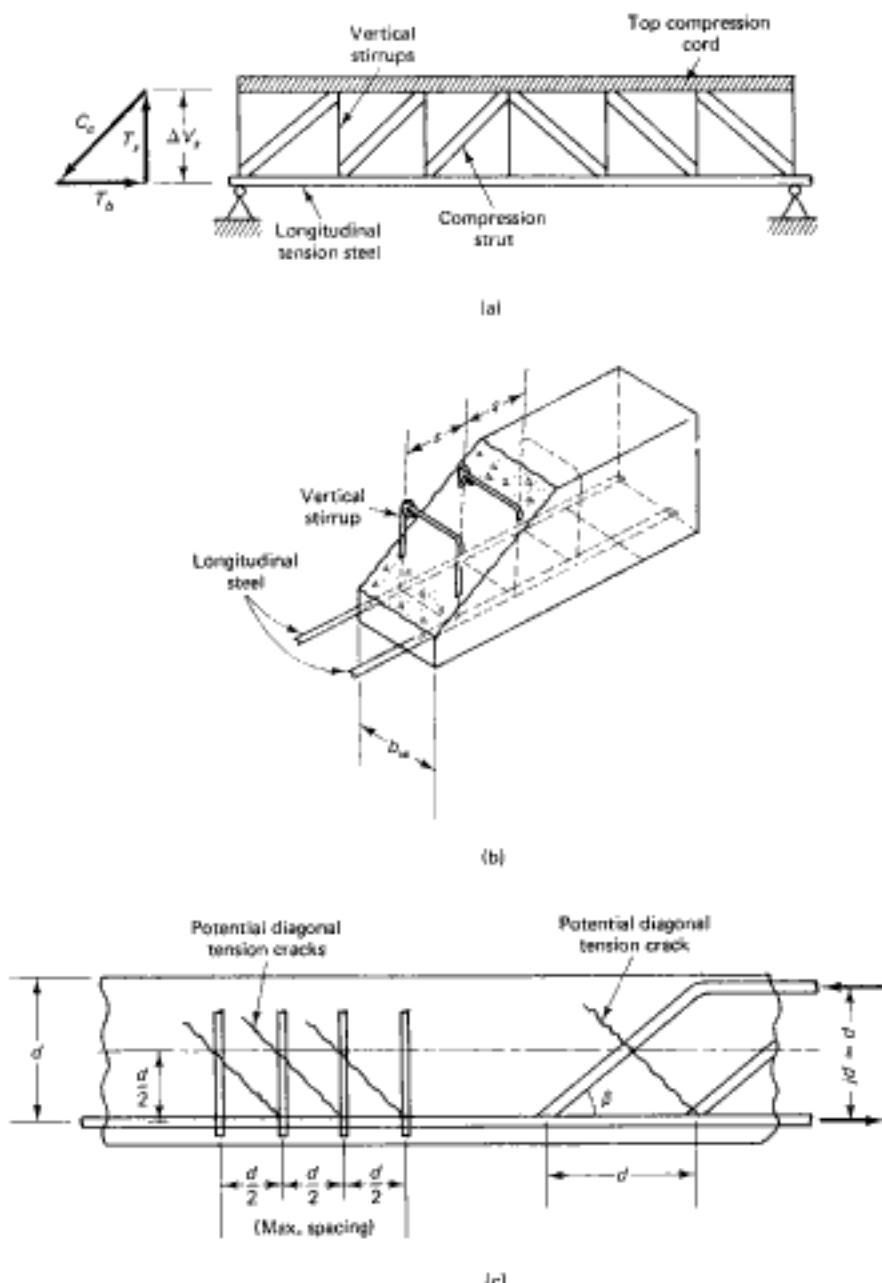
A Diagonal tension failure mechanism: (a) failure pattern; (b) concrete simulated strut; (c) planar truss analogy.
